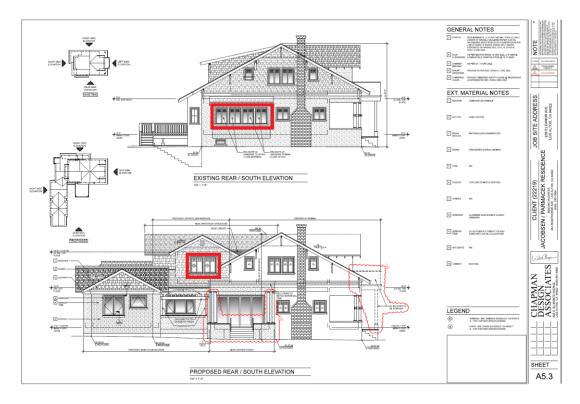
Sheet A5.3 shows the original windows that will be relocated and their proposed locations (Chapman Design Associates, 10/17/2024).
